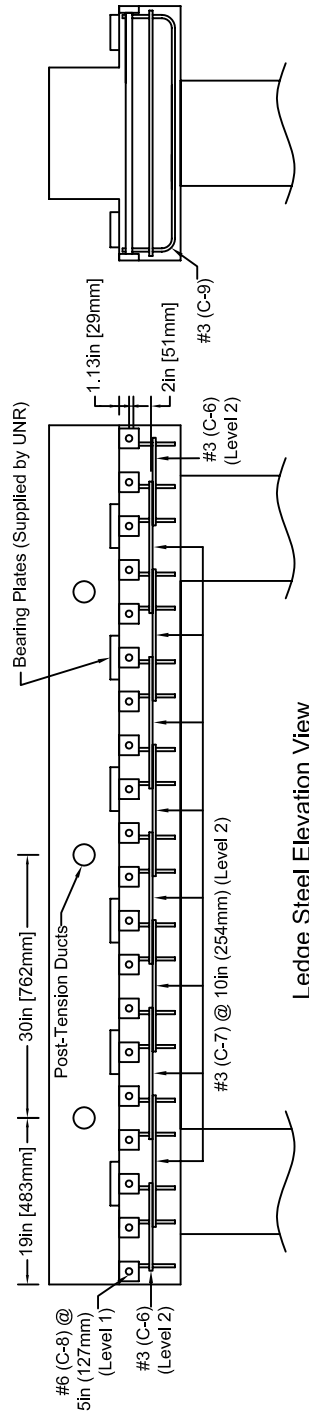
Bridge Plans Sheet 8; Bent 2 Joint Reinforcement.
